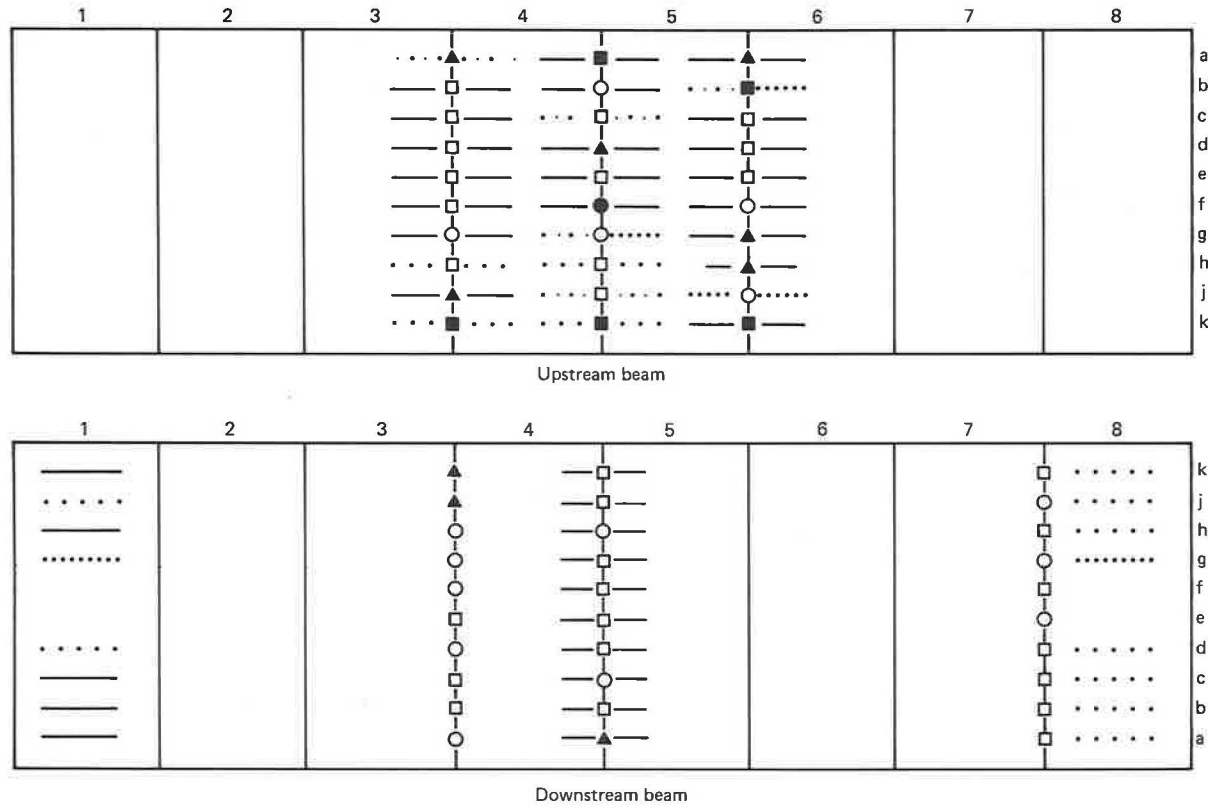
Ynys-y-Gwas bridge (1953-85) plan view of deck.
